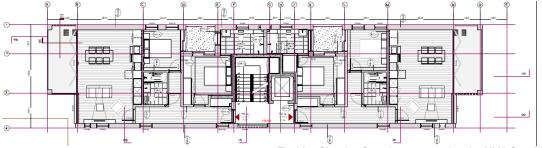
Showing floorplan approved under NMA for 58 WRS.
